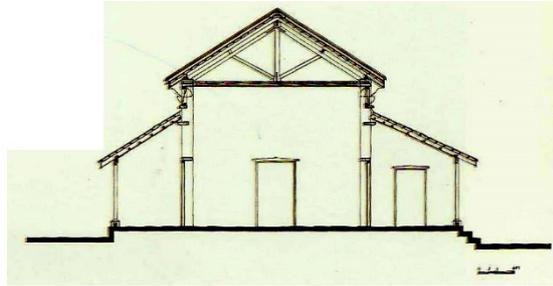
Section of an Army Barrack, Karachi. Drawing prepared in 1936.
